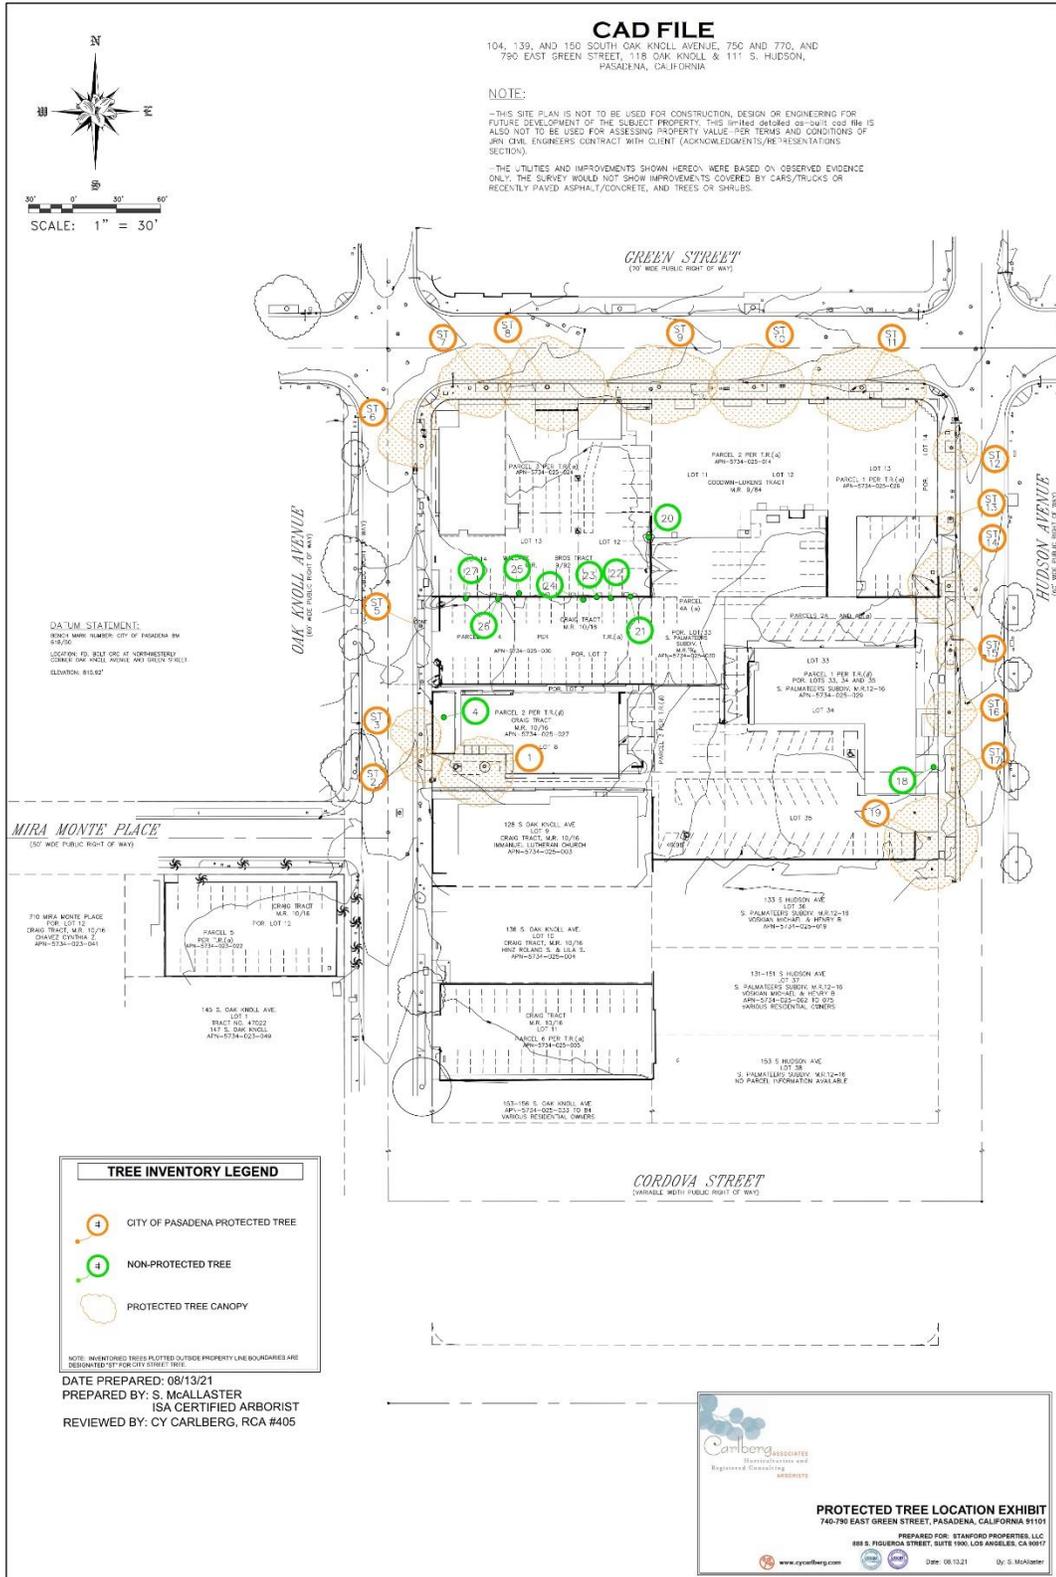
EXHIBIT C – REDUCED COPY OF THE PROTECTED TREE IMPACT EXHIBIT & PROTECTION PLAN (not to scale)
